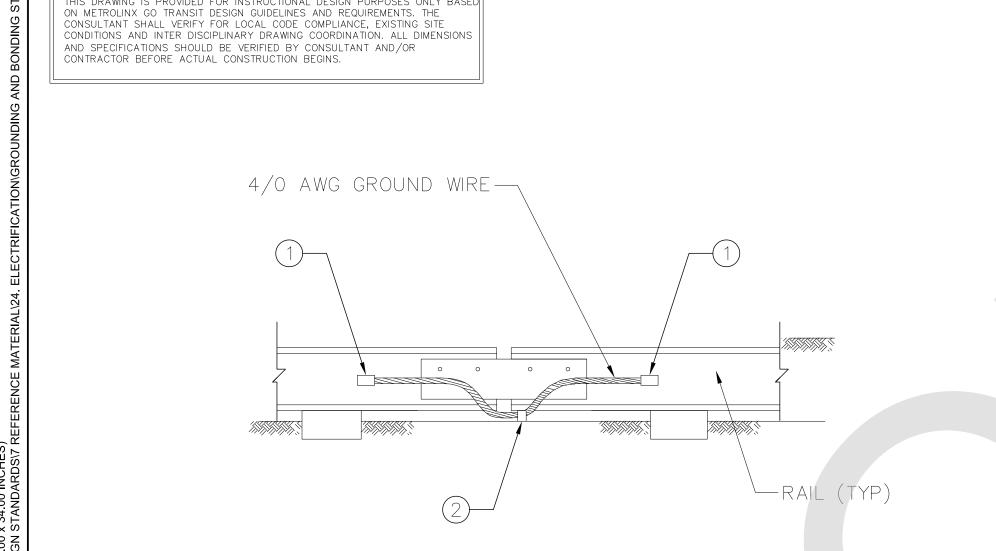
GROUND CONDUCTOR UNDER TRACK CROSSING
